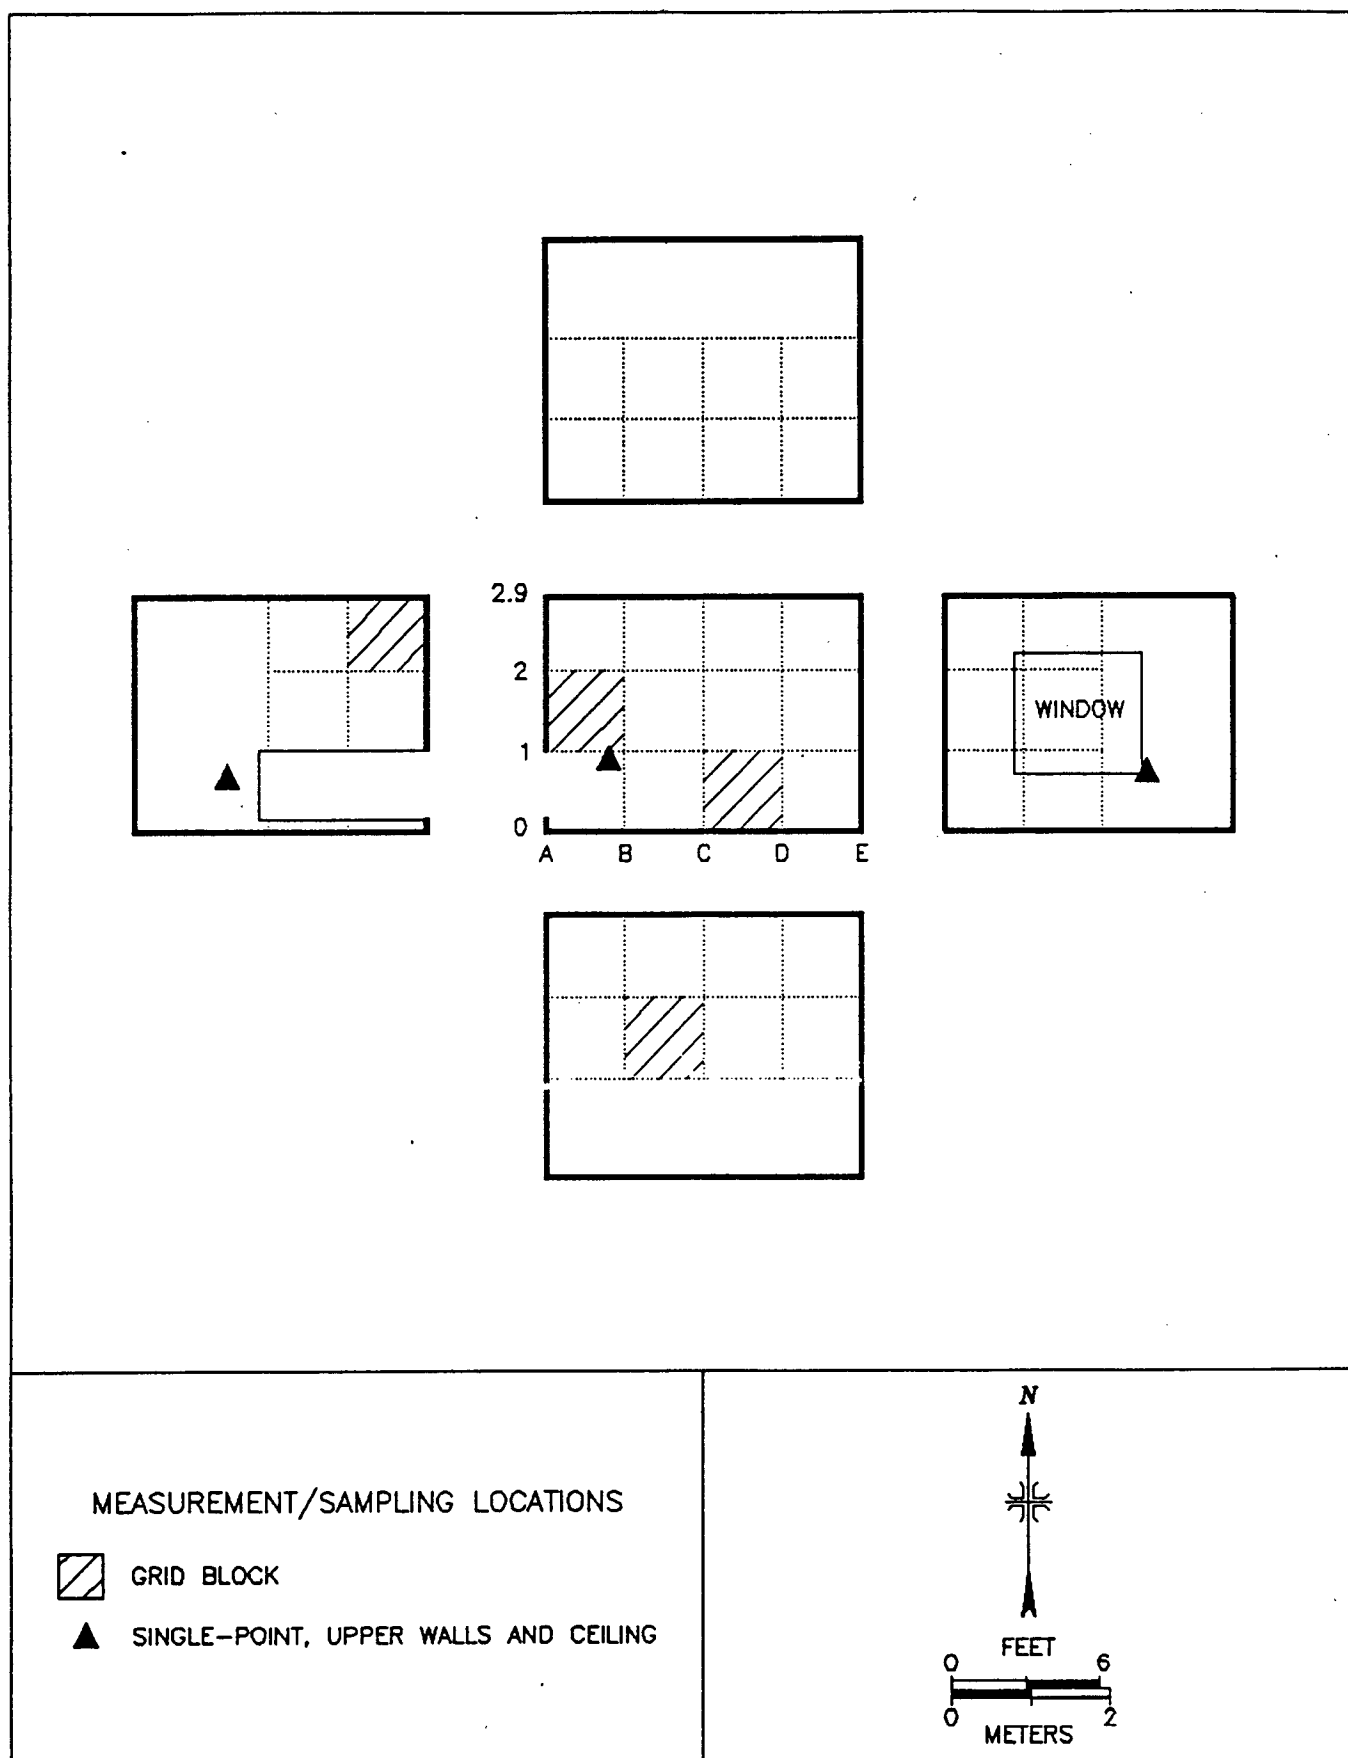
Building 401A, Room 15 – Measurement and Sampling Locations
